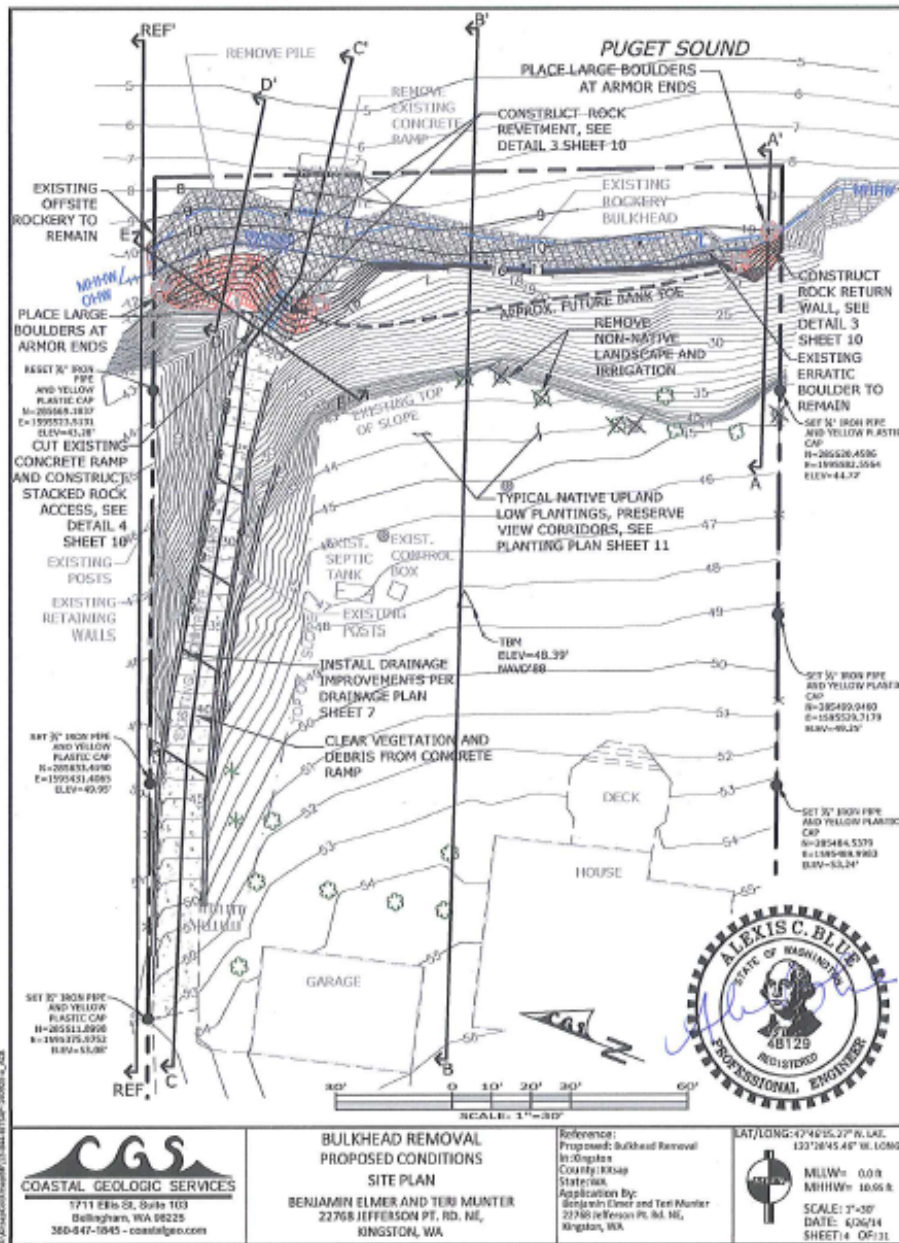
OVERALL SITE PLAN FOR BULKHEAD REMOVAL.
